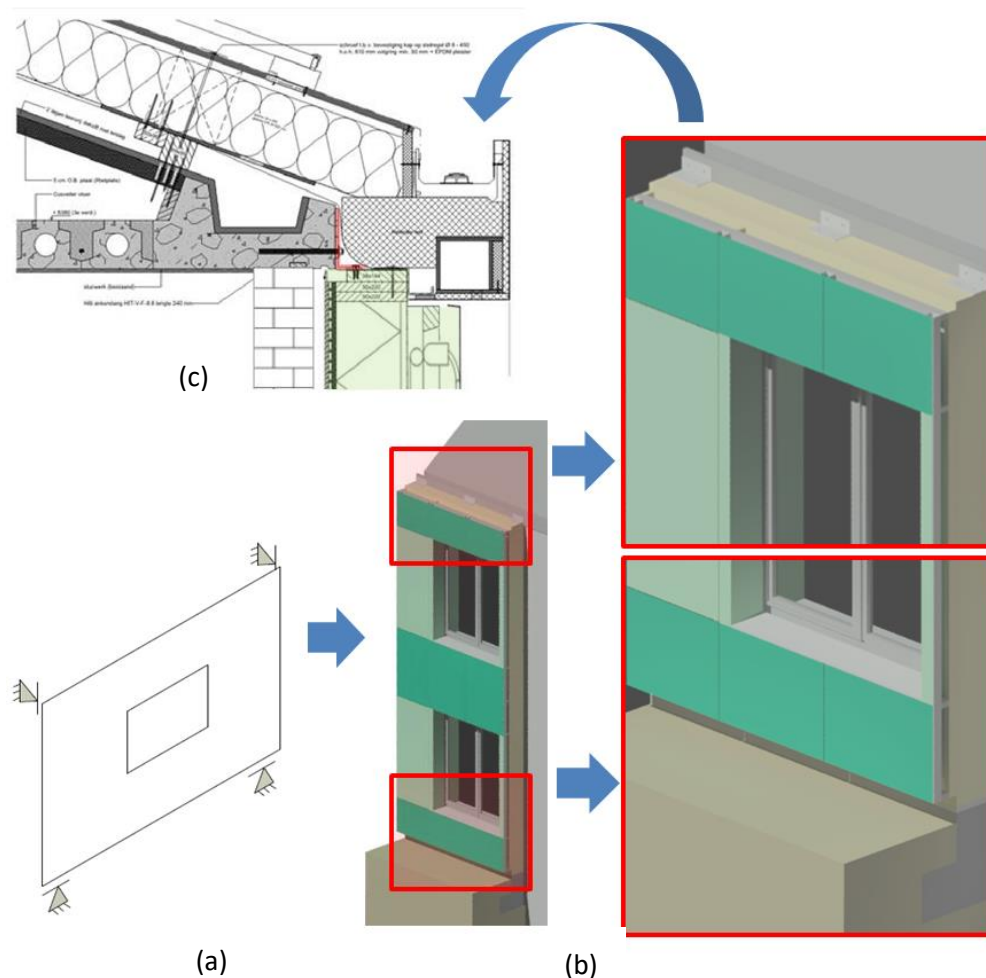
(a) Simplified static scheme of the Fixing System, (b) 3d model of the connections and (c) Detail of the module anchorage to the slab edge of the roof
